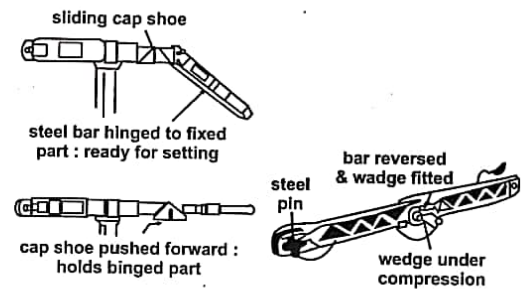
Cantilever bars of capped shoe type and (bottom) of wedged type
